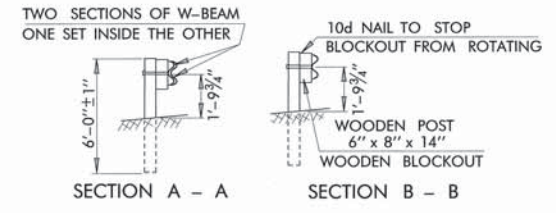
DETAIL OF GUARDRAIL POST IN SHOULDER BASE WIDENING
